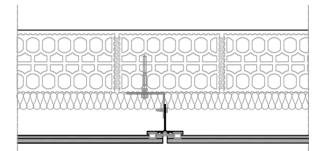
Horizontal section. Faveton® SAH Ceram 20.
